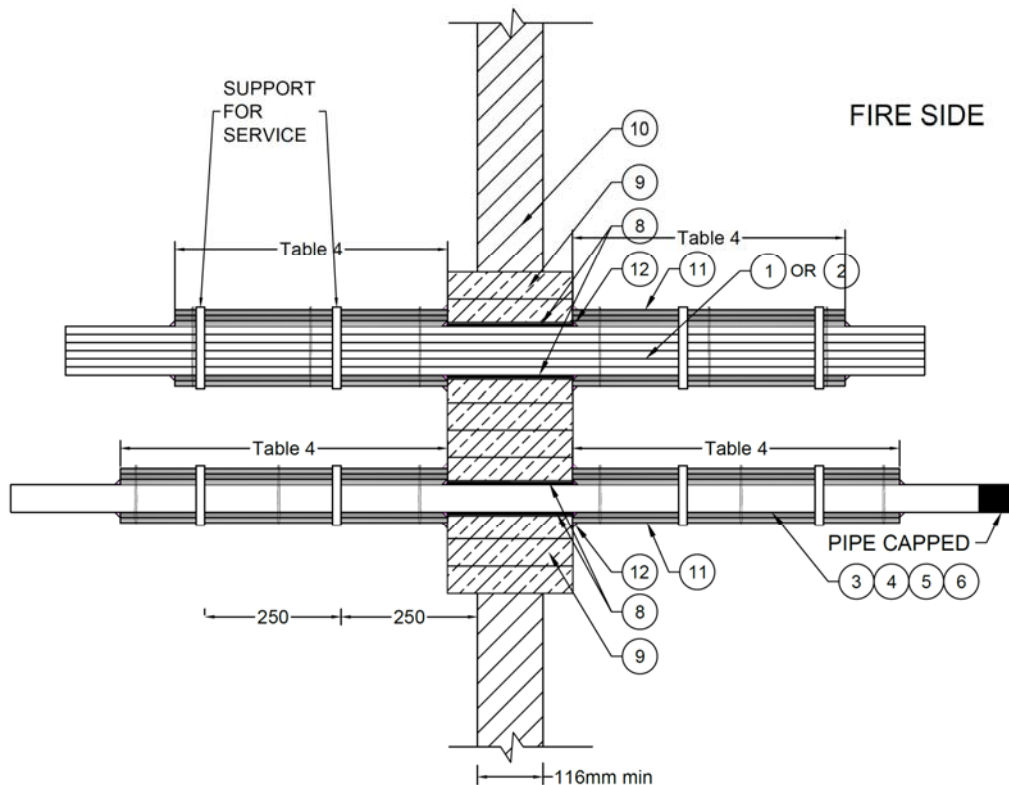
Typical details for wrapped cables and metal pipes in masonry or concrete walls
